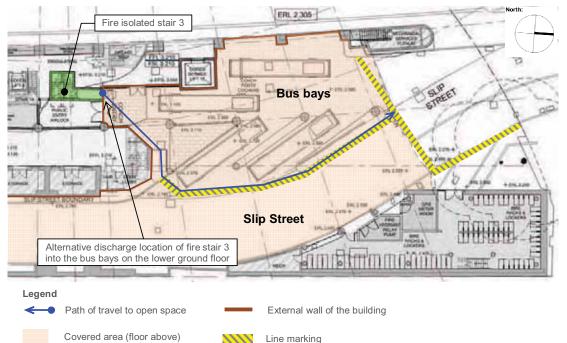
Alternative discharge location of fire isolated stair 3 on the lower ground floor
